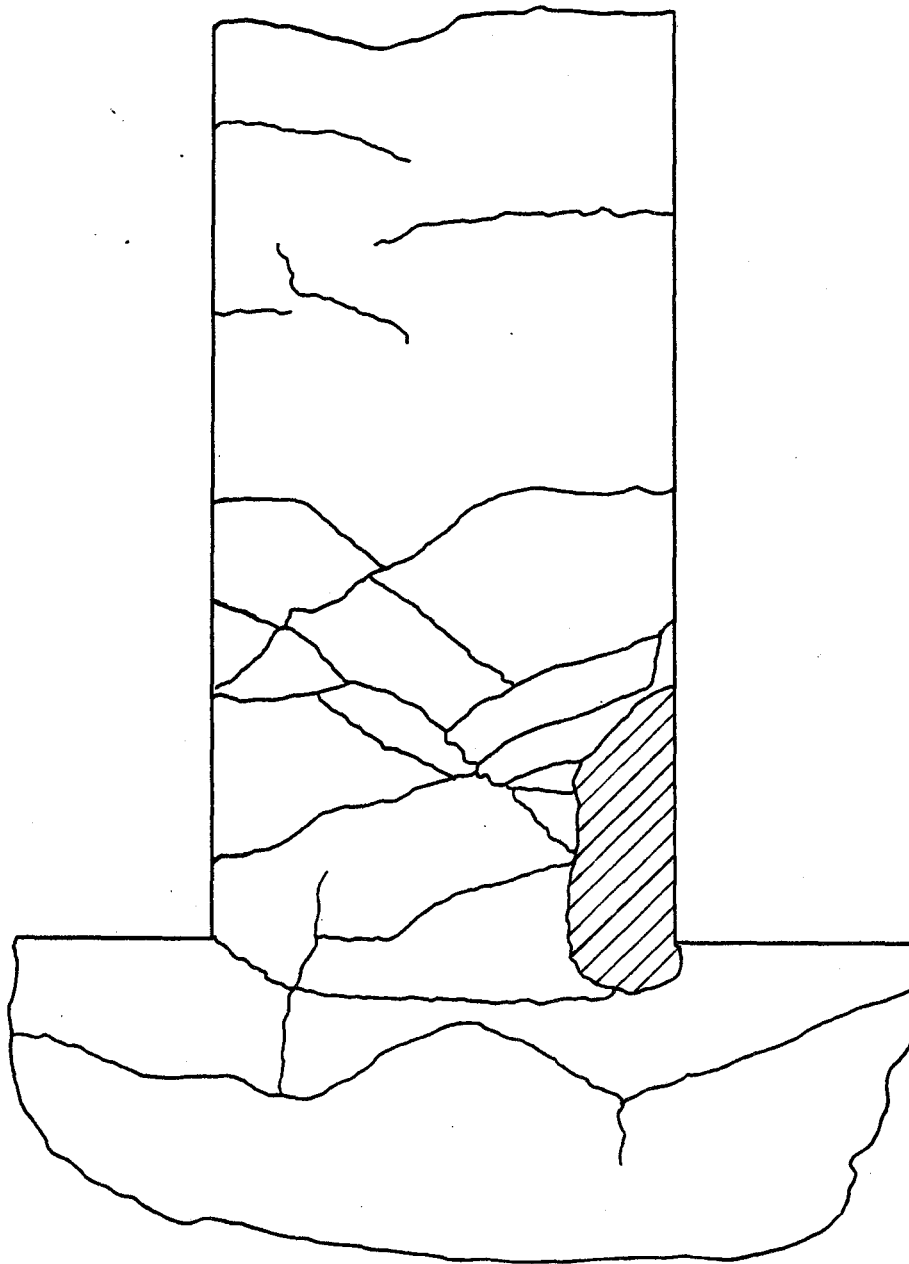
(c) Crack Pattern South Face, Specimen L4D2
